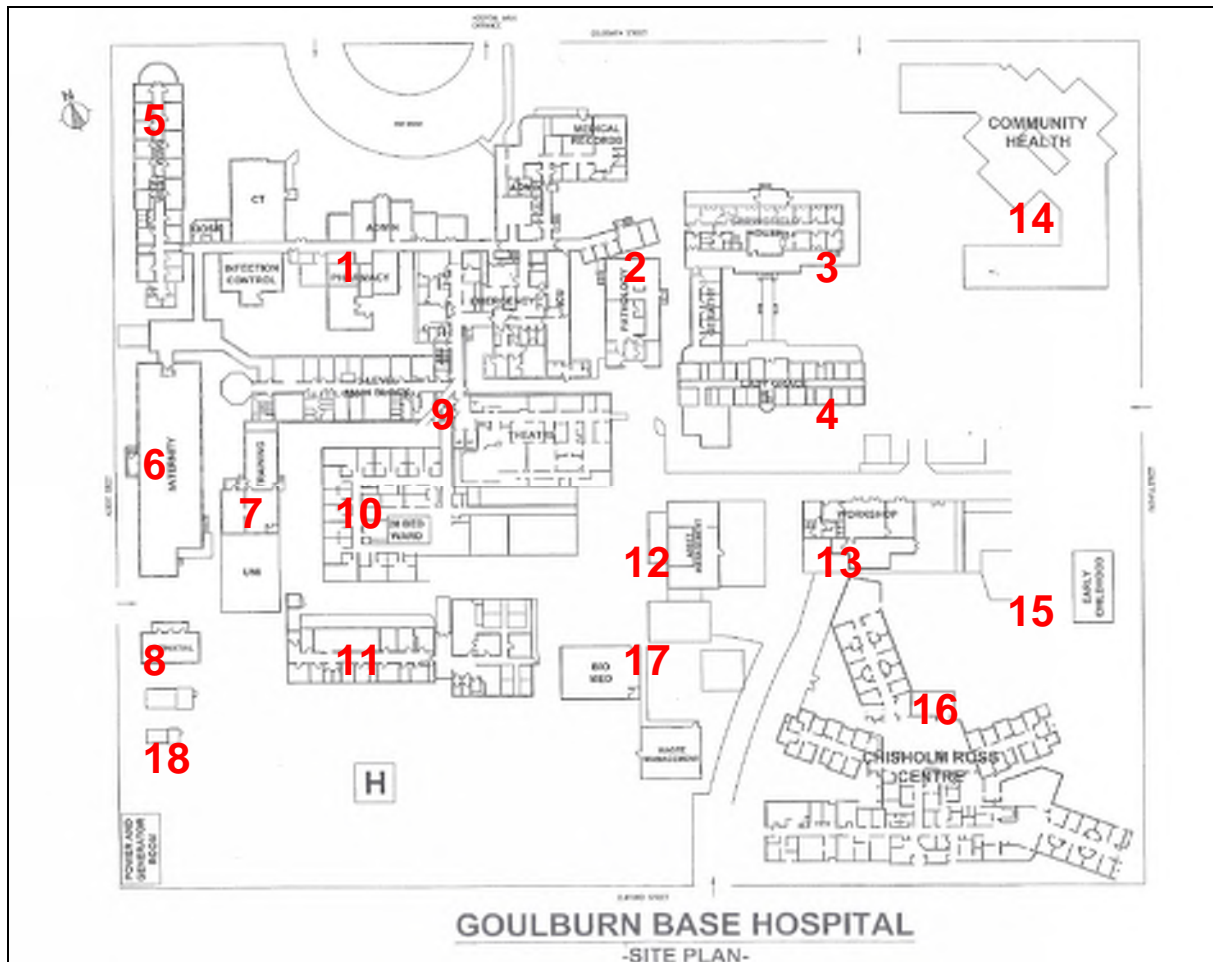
Site plan. (Source: GBH, SNSWLHD Asset Services Operations Office)
